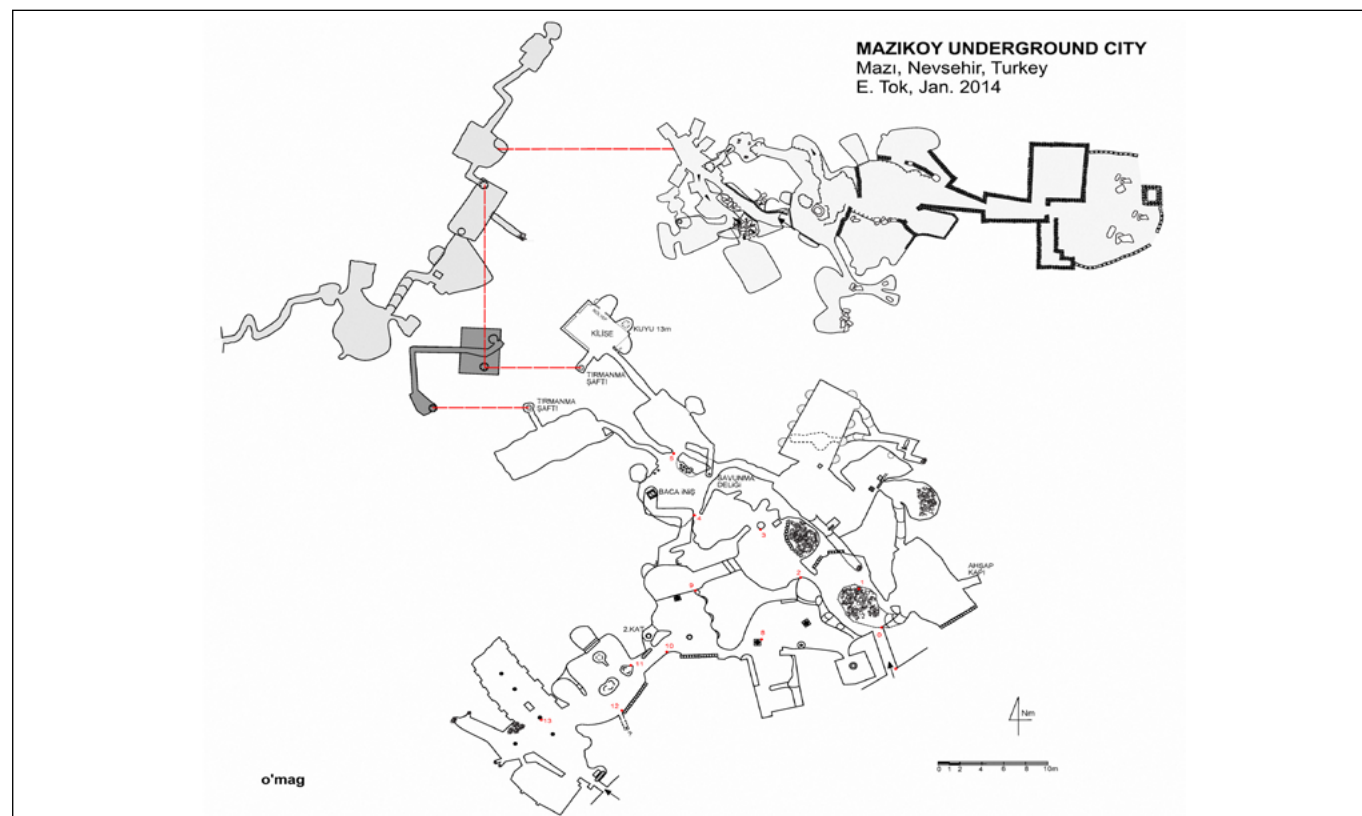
plan of Mazikoy Underground City (drawing E. Tok).
